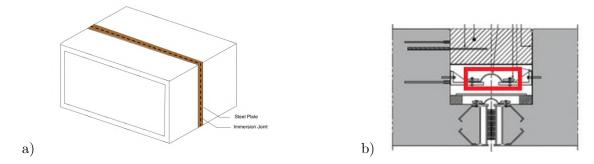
a) Protective steel plates outside immersion joint b) Additional watertight layer above Omega seal (Van Montfort, 2018)
